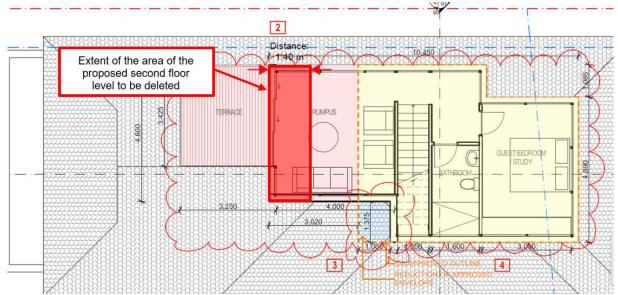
Plan showing the area of the second floor level which is recommended to be deleted under Condition C.9(a)
